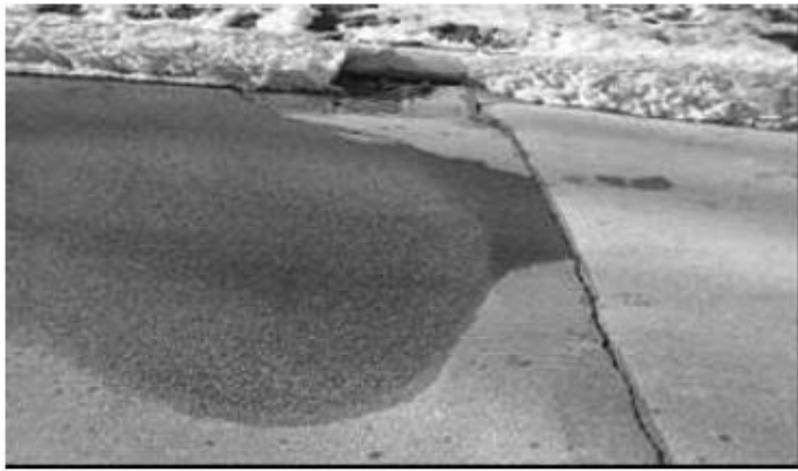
Water from melting snow readily enters pavement structure through a transverse crack.
